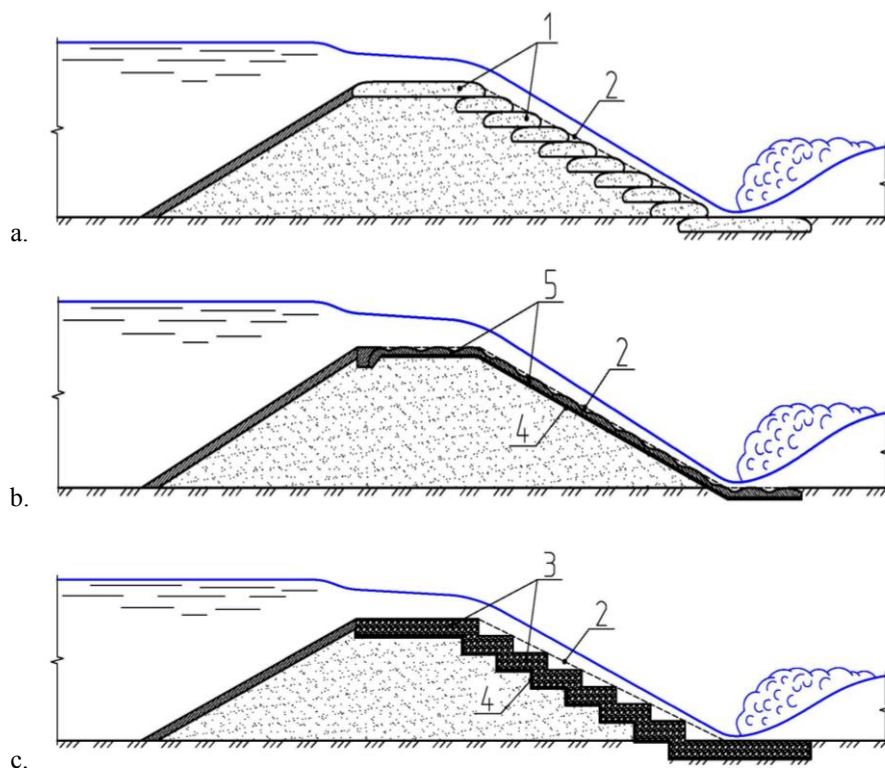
The proposed structures of overflowing phreatic dams: a. with geosynthetic shells; b. with concrete-filled textile floor-floor-mats; c. with coarse-pored concrete; 1 - geosynthetic shells; 2 - smooth downstream slope; 3 - coarse-pored concrete; 4 - geotextile filter; 5 - concrete-filled textile floor-floor-mats.
